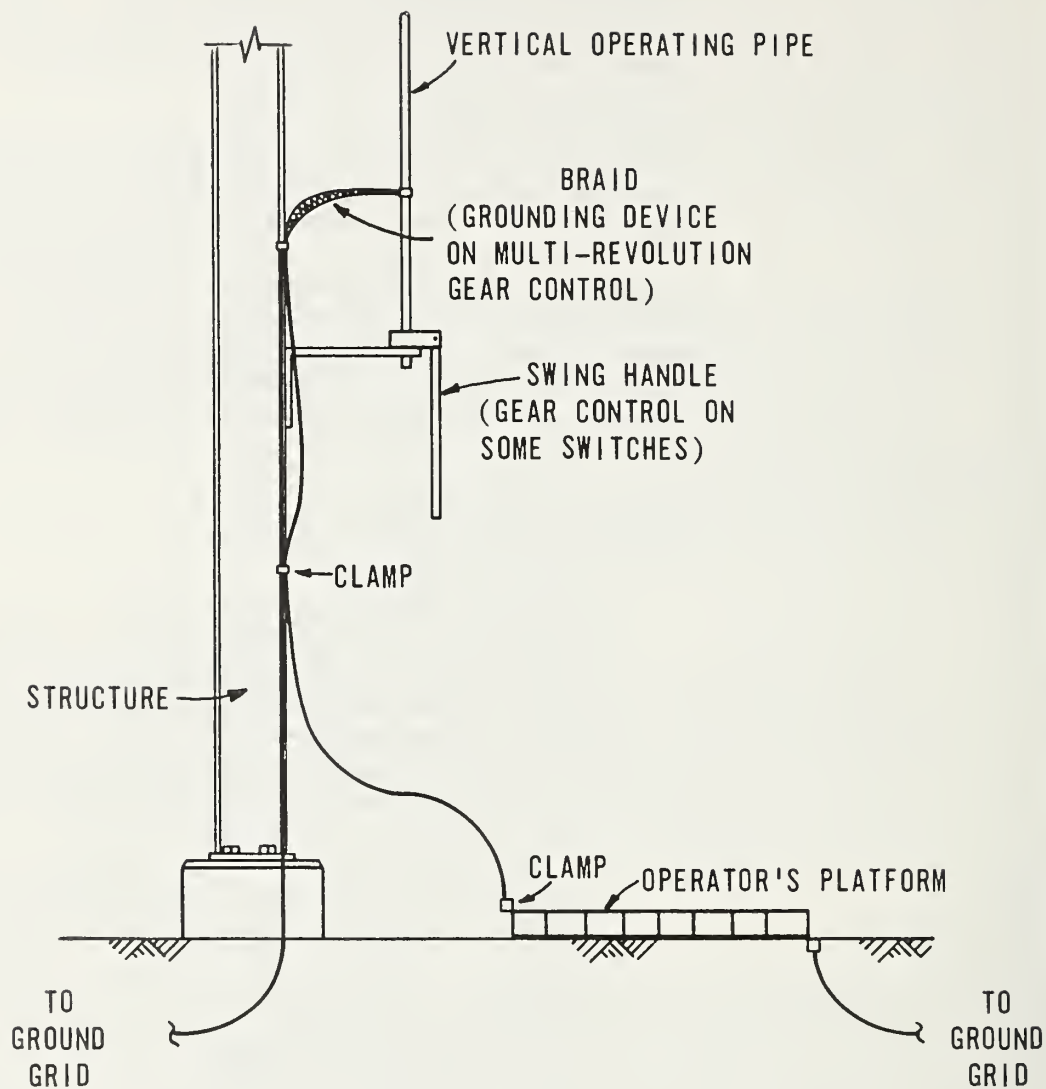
TYPICAL SWITCH GROUNDING
